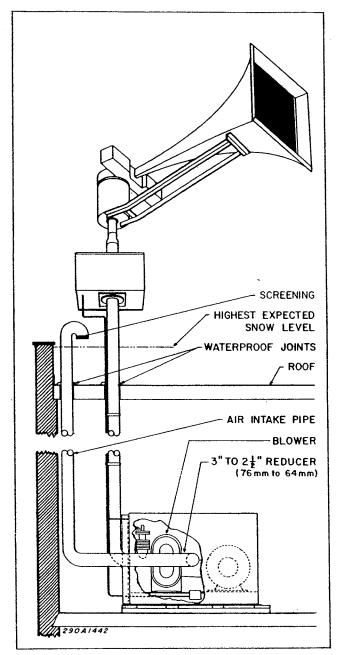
Interior-Exterior Thunderbolt Installation (2).
